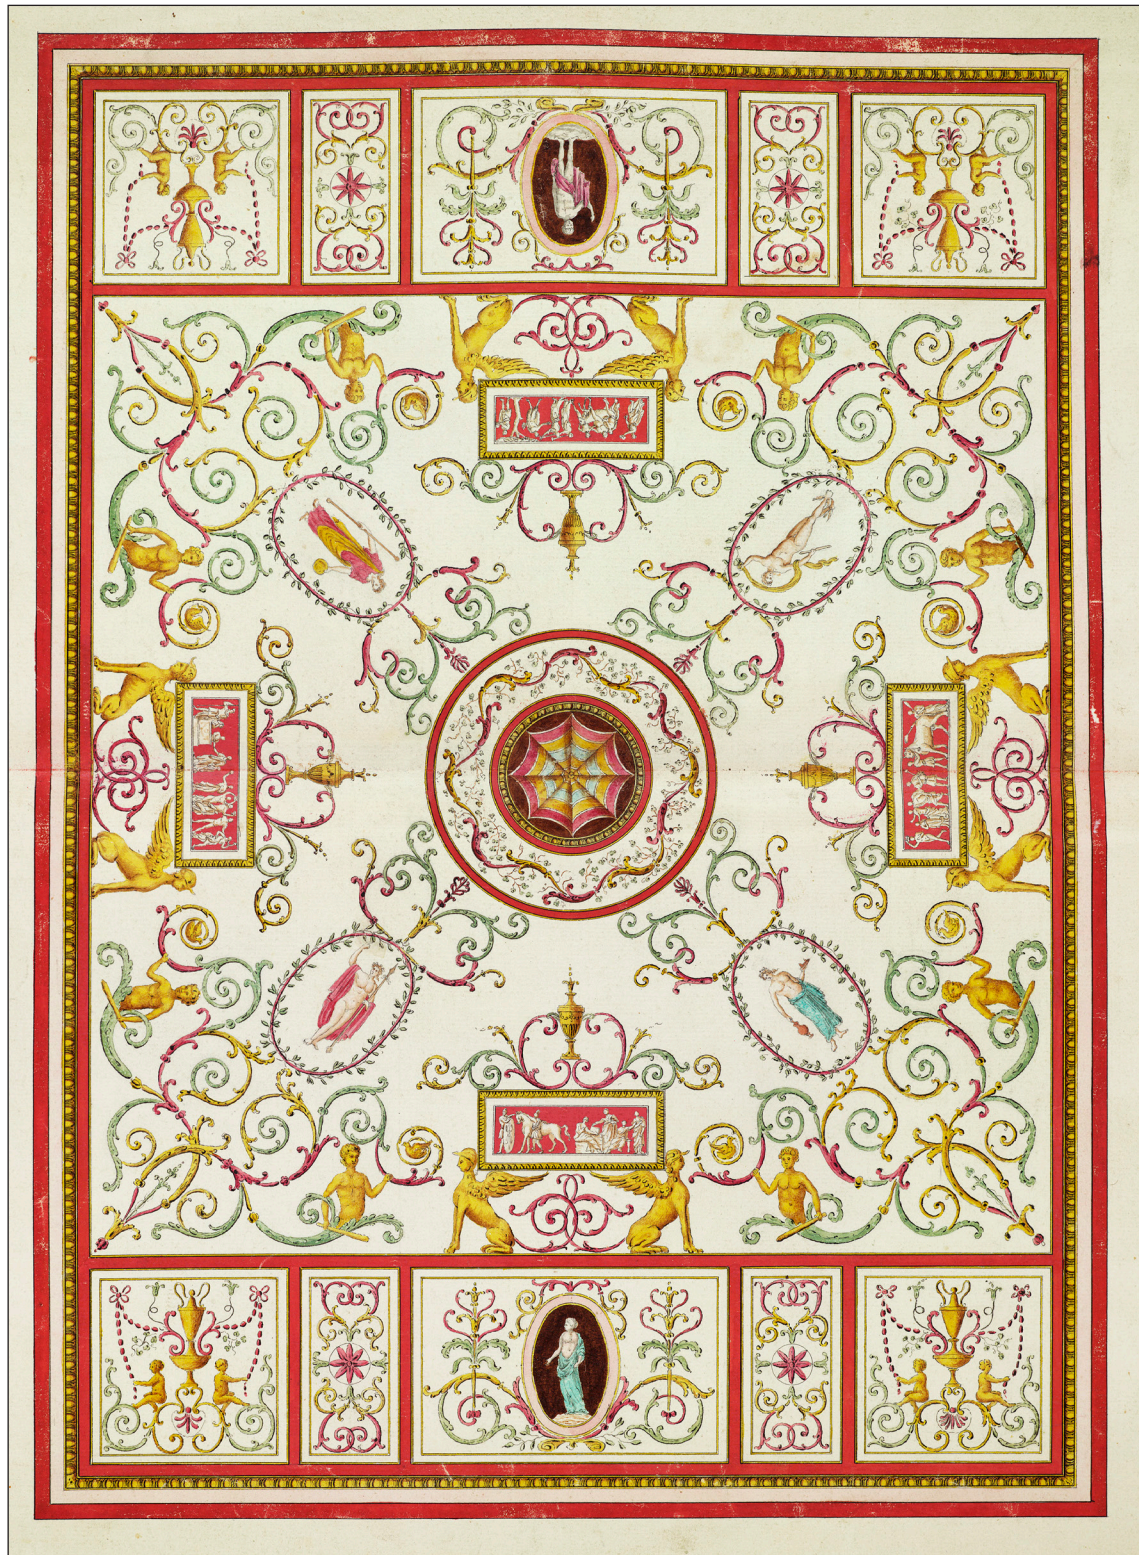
Ceiling design, Clarendon House, Surrey, 1771. RIBA VOS/120
